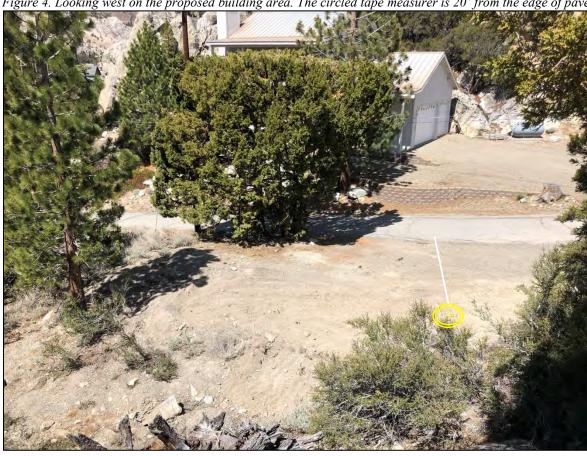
Looking west on the proposed building area. The circled tape measurer is 20' from the edge of pavement.
